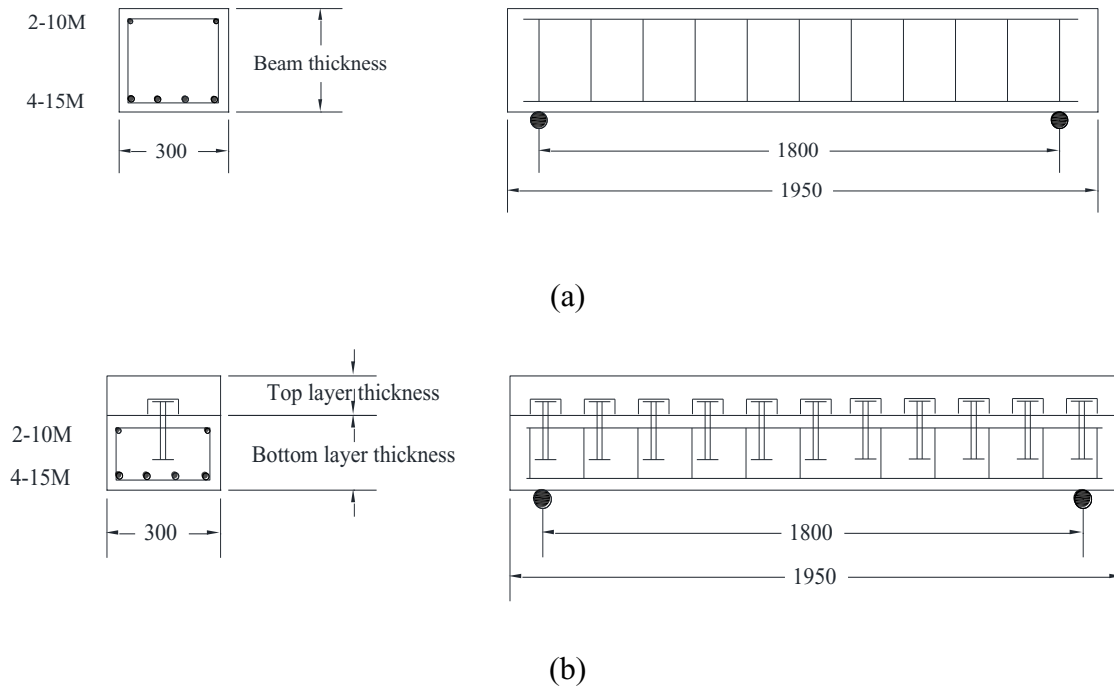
Details of typical beams tested by (Hamed 2018) in mm (a) non-composite beam and (b) composite beam.
